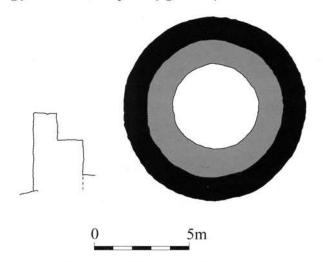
Site WHKRS 36. Sketch plan and elevation of the watchtower.
